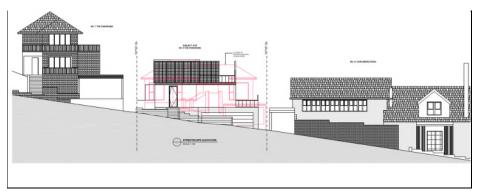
Proposed streetscape (east) elevation with overlay of existing dwelling in red (Without Prejudice Plans)
